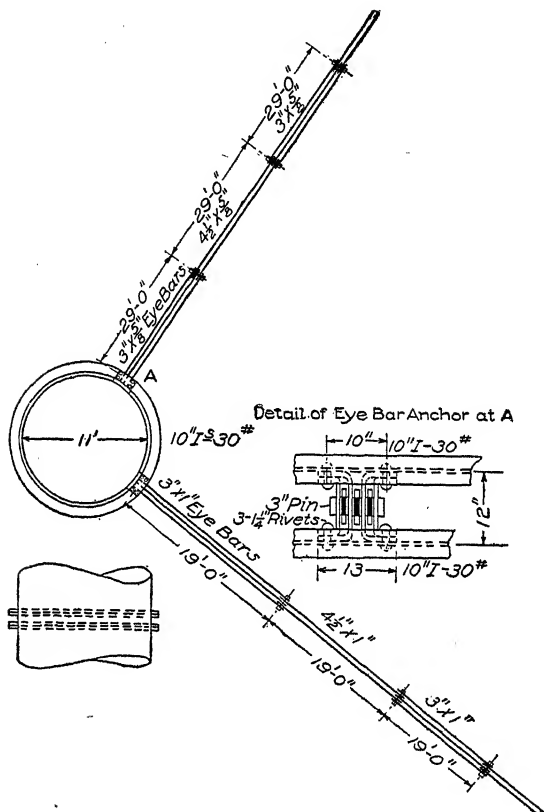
Anchor at Top of Penstock in Plant of Hydraulic Power Company
